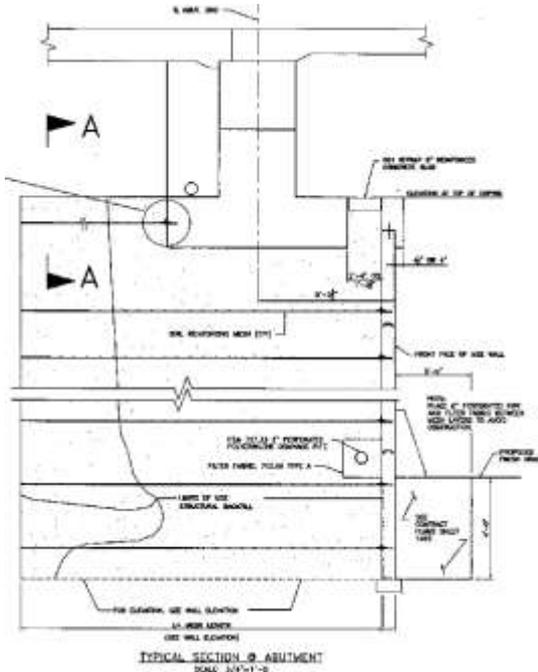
H.3 Cross Section of the Soil Reinforcement Layout
